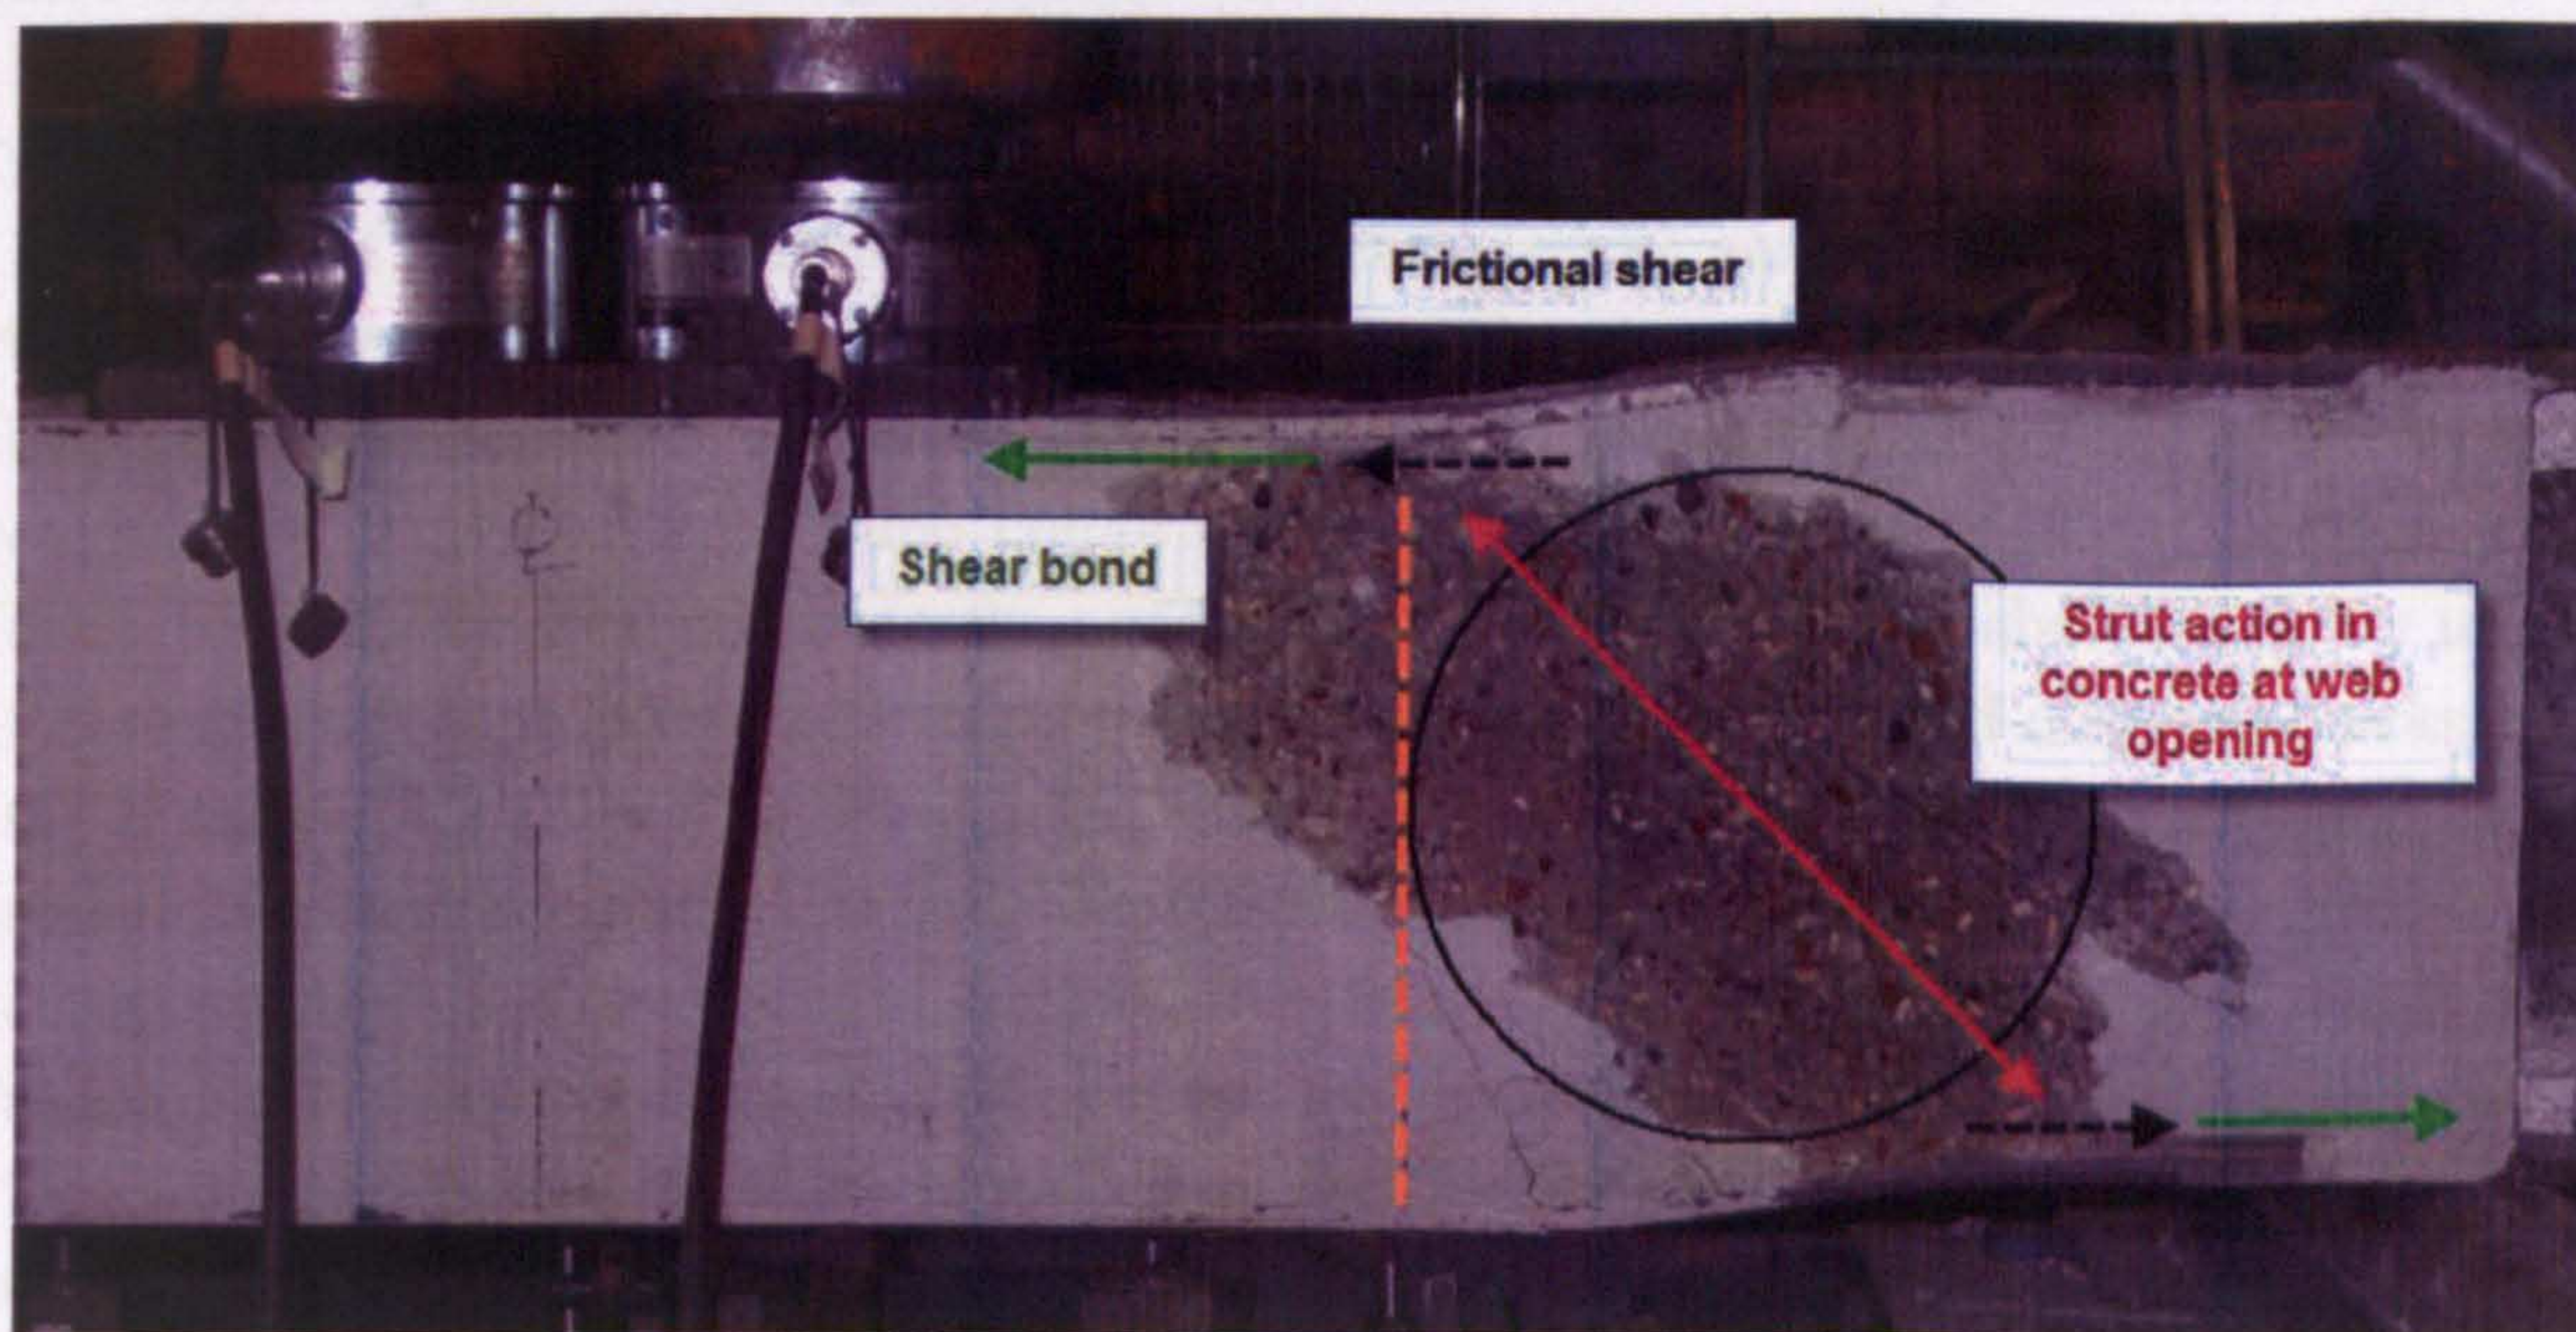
Compression force acting in the concrete encasement across the web openings
